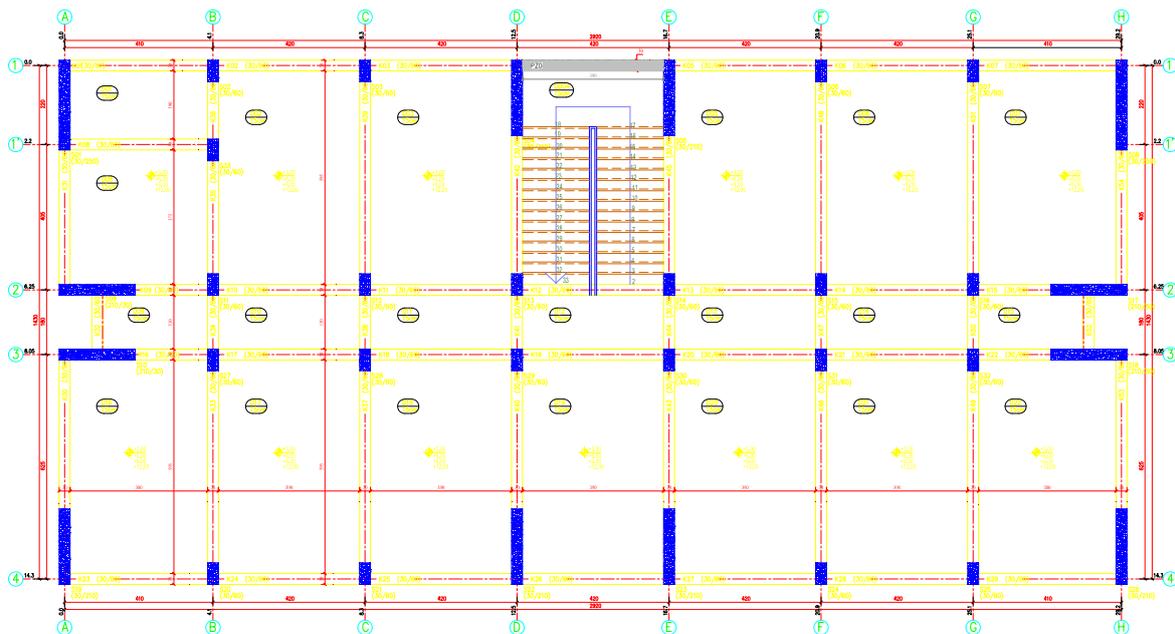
Strengthening of Merkez Cumhuriyet primary school in Van by adding shear wall
